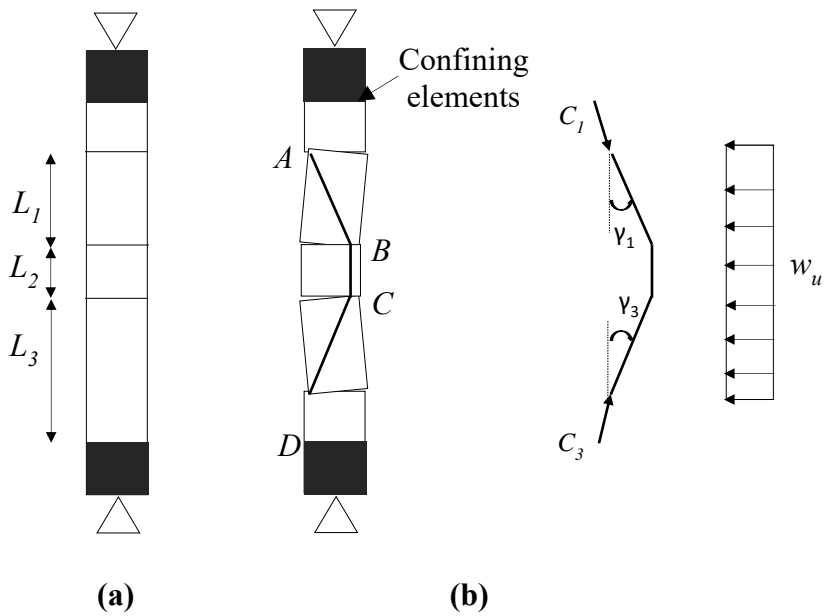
Strut method for computing the lateral wall pressure: (a) wall in its original position, and (b) equilibrium of horizontal forces on the wall (based on Varela et al. 2012).
